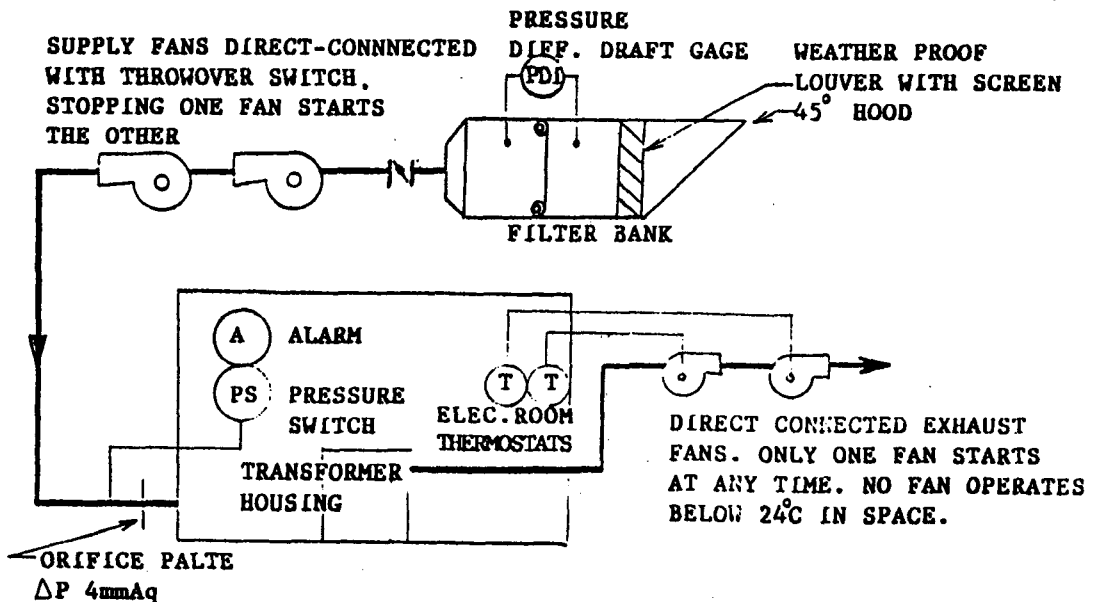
Typical Ventilation System for Substations Containing dry Transformers
